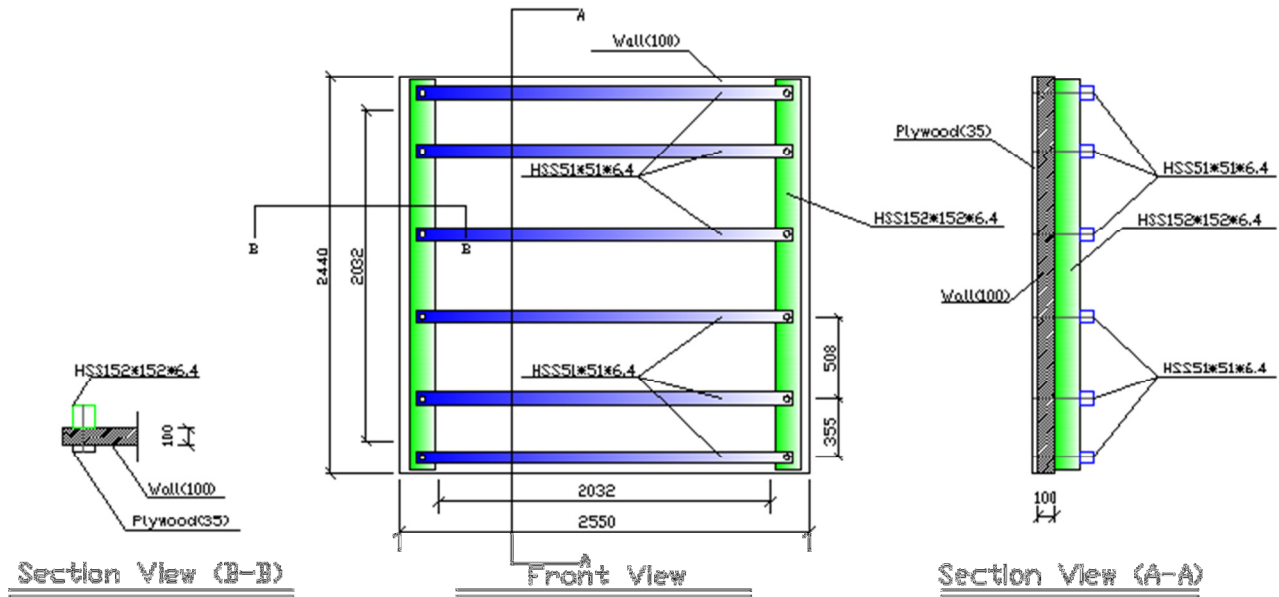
Boundary condition for Wall 2 (all dimensions in mm)
